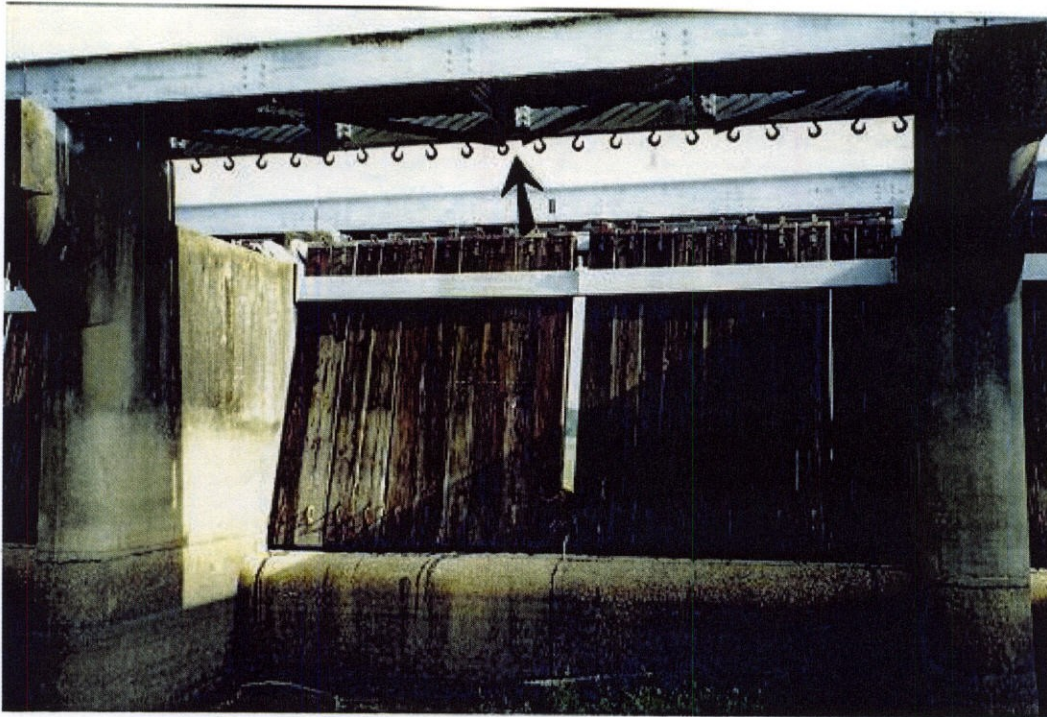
Underside of the riverside bridge (areas of corrosion and peeling paint were noted on the stringers and lateral bracing as well as the connection angles between the two).
